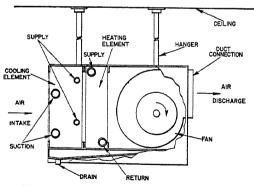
Horizontal Remote Type Unit Air Conditioner
